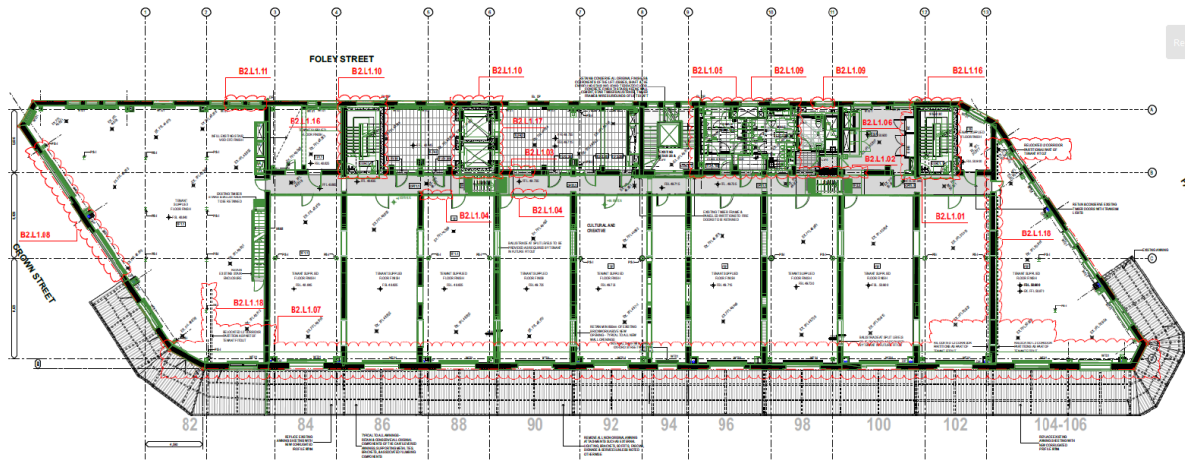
Comparison between the approved level 1 floor plan and the proposed level 1 floor plan showing removal of eastern lightwell ribs, new internal openings, revised bathroom layout, retention of stair 2A and 2C and new lift core location
